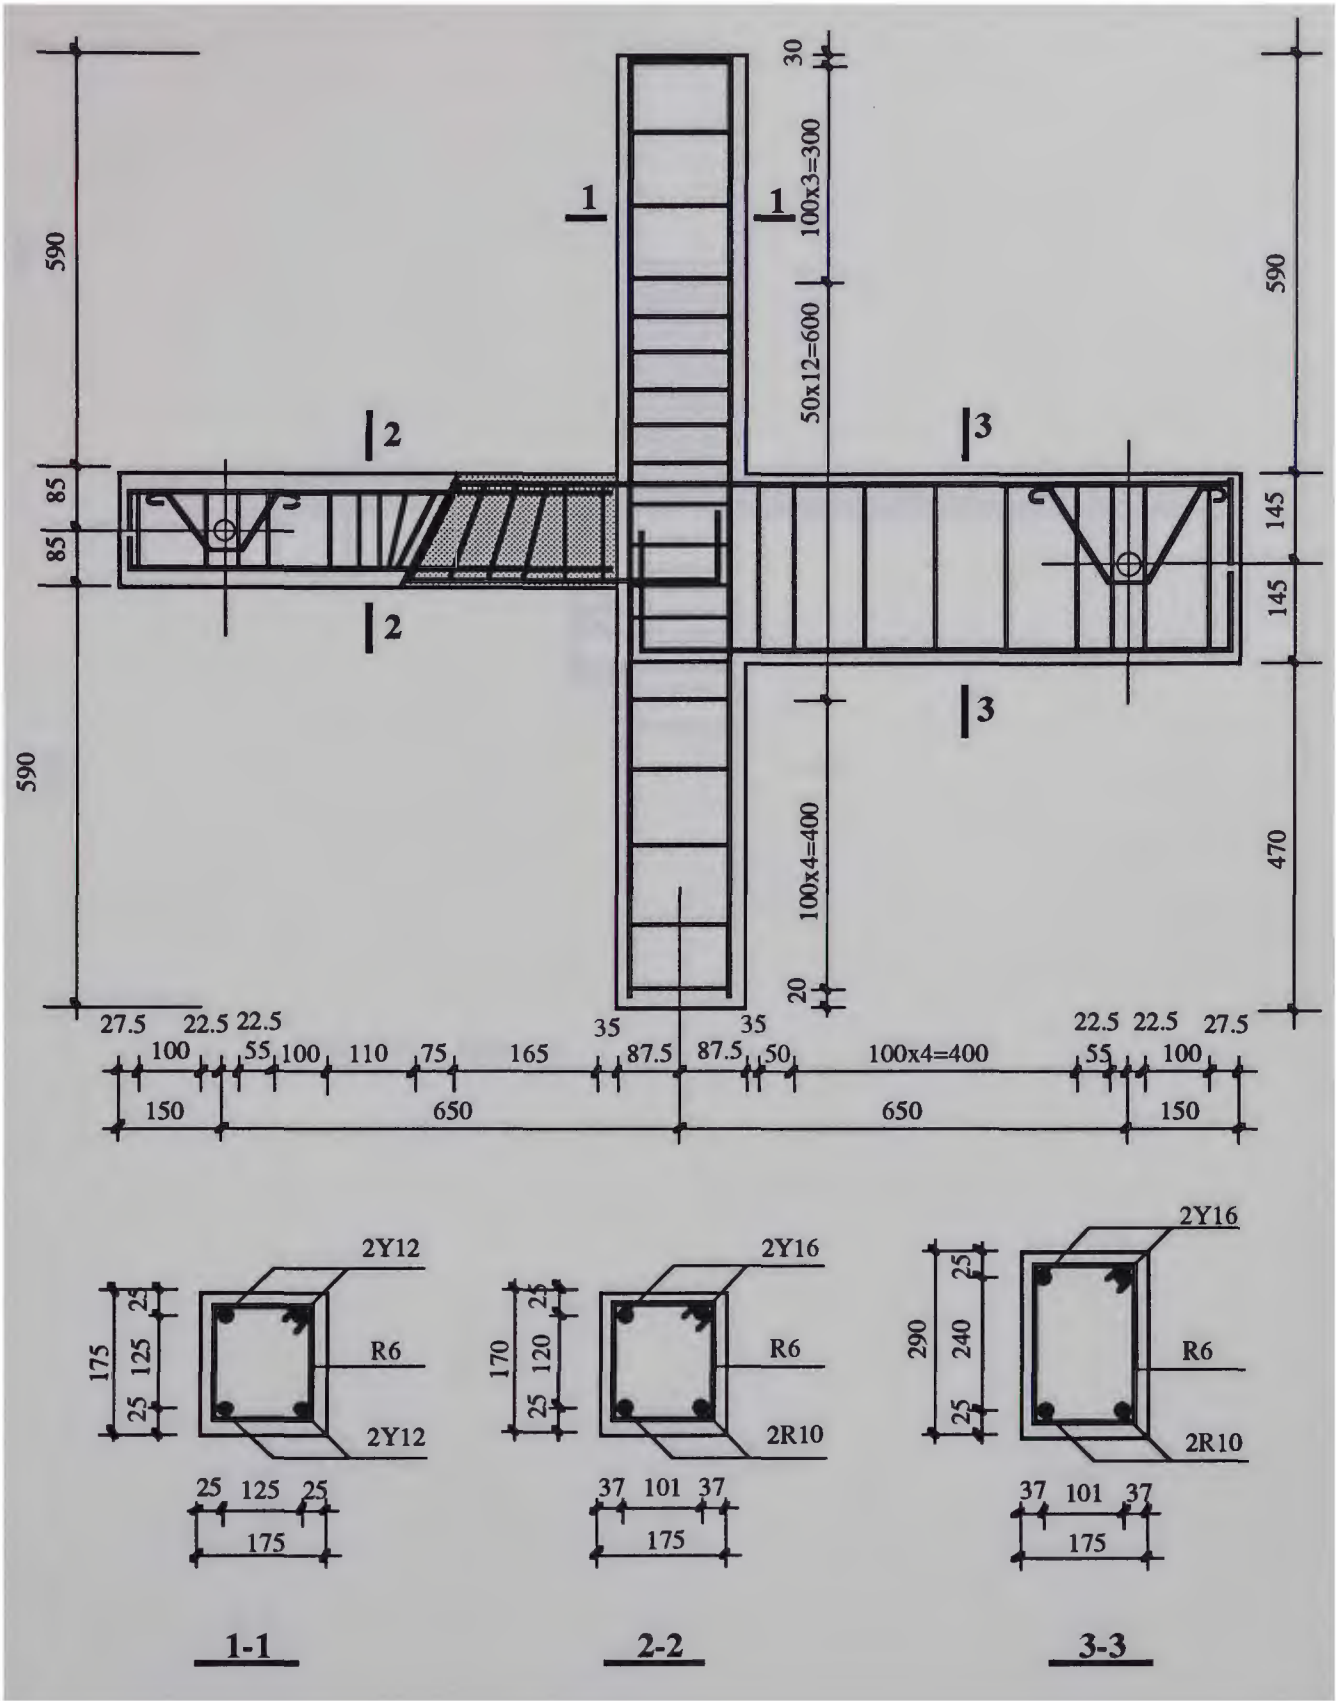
Detail of Specimens SPA1 & RPA1
